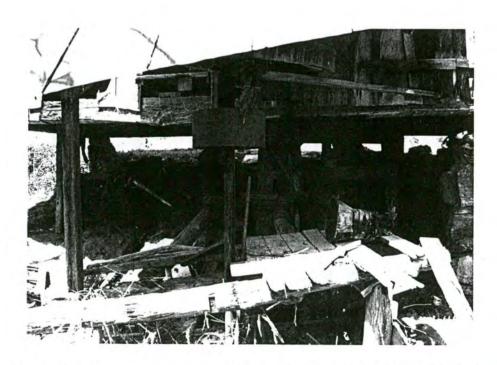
Milling Equipment on South Elevation of Mill, Facing North
